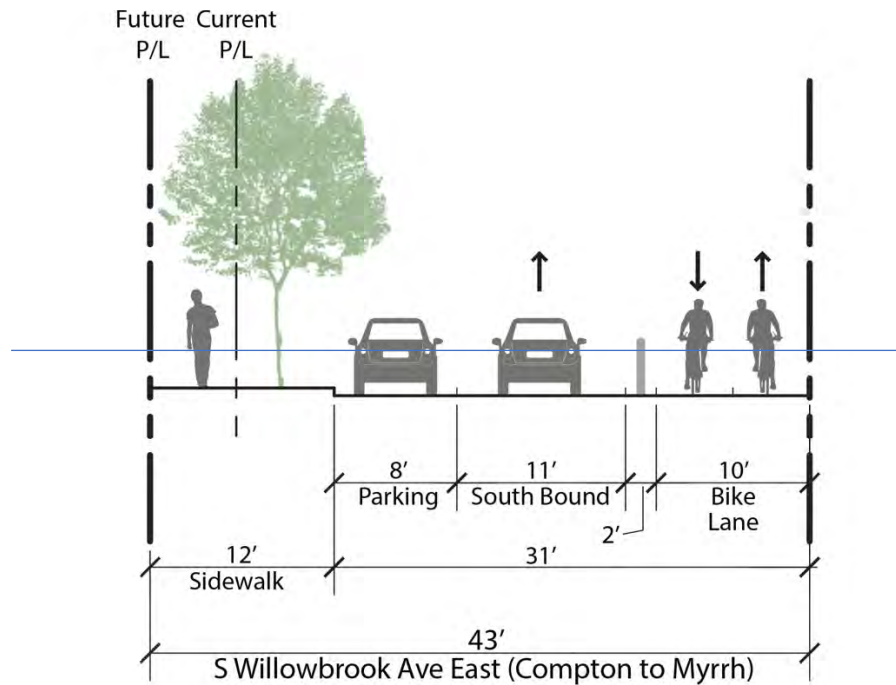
South Willowbrook Avenue East (Compton to Myrrh) Typical Cross-Section.
